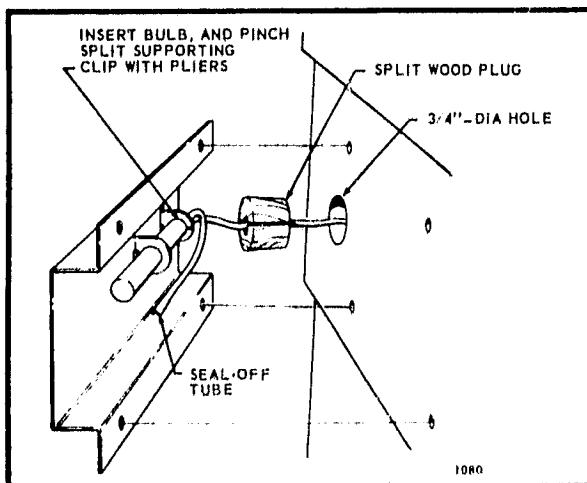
MOUNTING BULB IN SHIELD OUTSIDE BUILDING.
